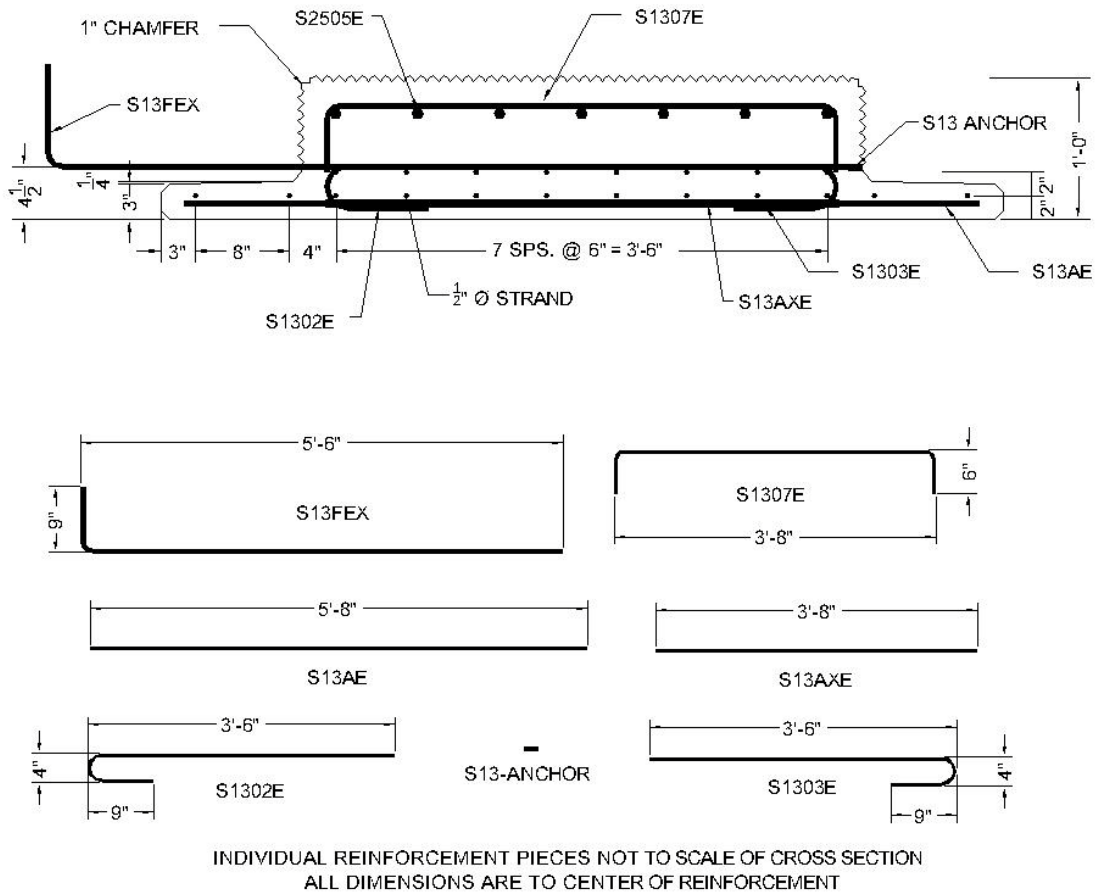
Cross section and individual reinforcement details for the east end of the precast beam 1N in the Concept 2 laboratory bridge specimen
